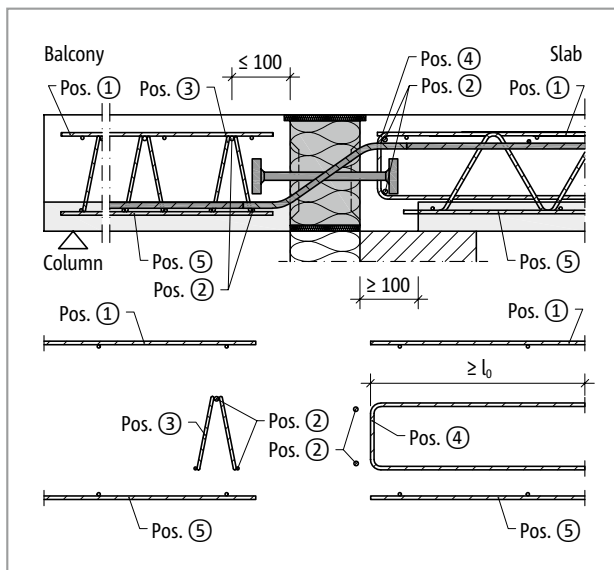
Schöck Isokorb® XT type Q-P: On-site reinforcement with lattice beam
